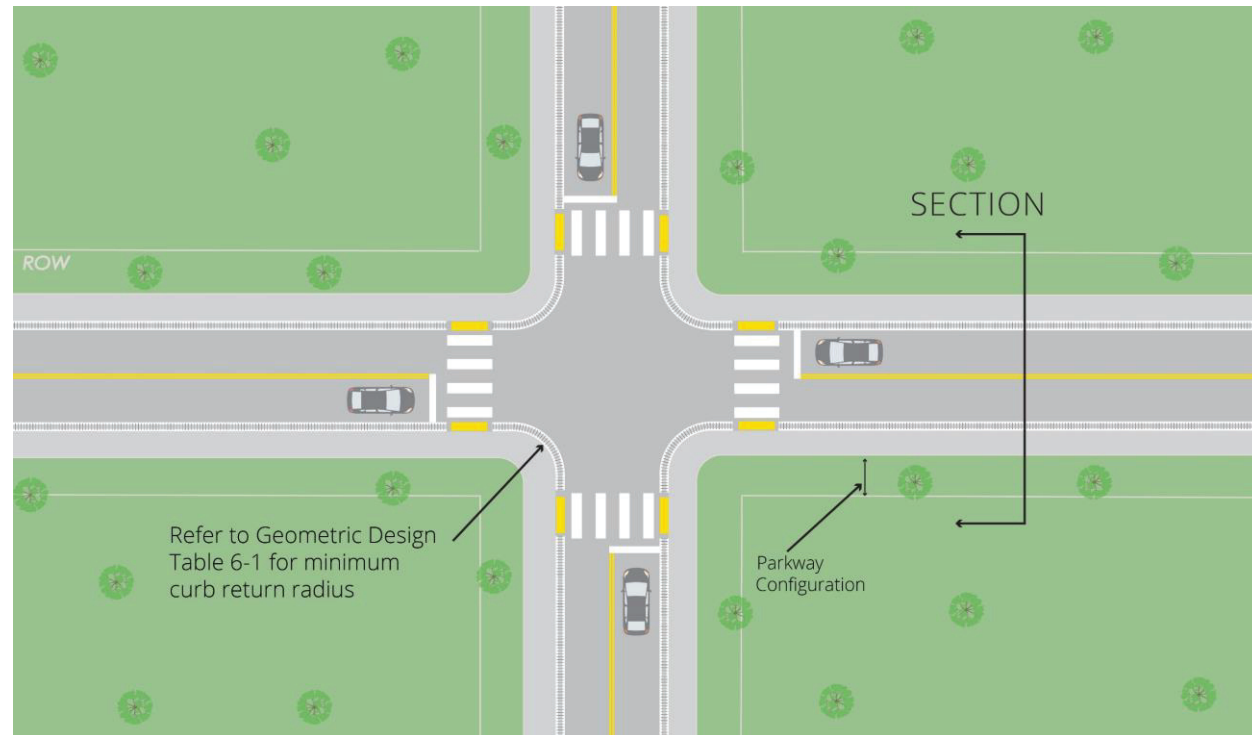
RURAL LOCAL ROAD PLAN VIEW (OPTION C2)
